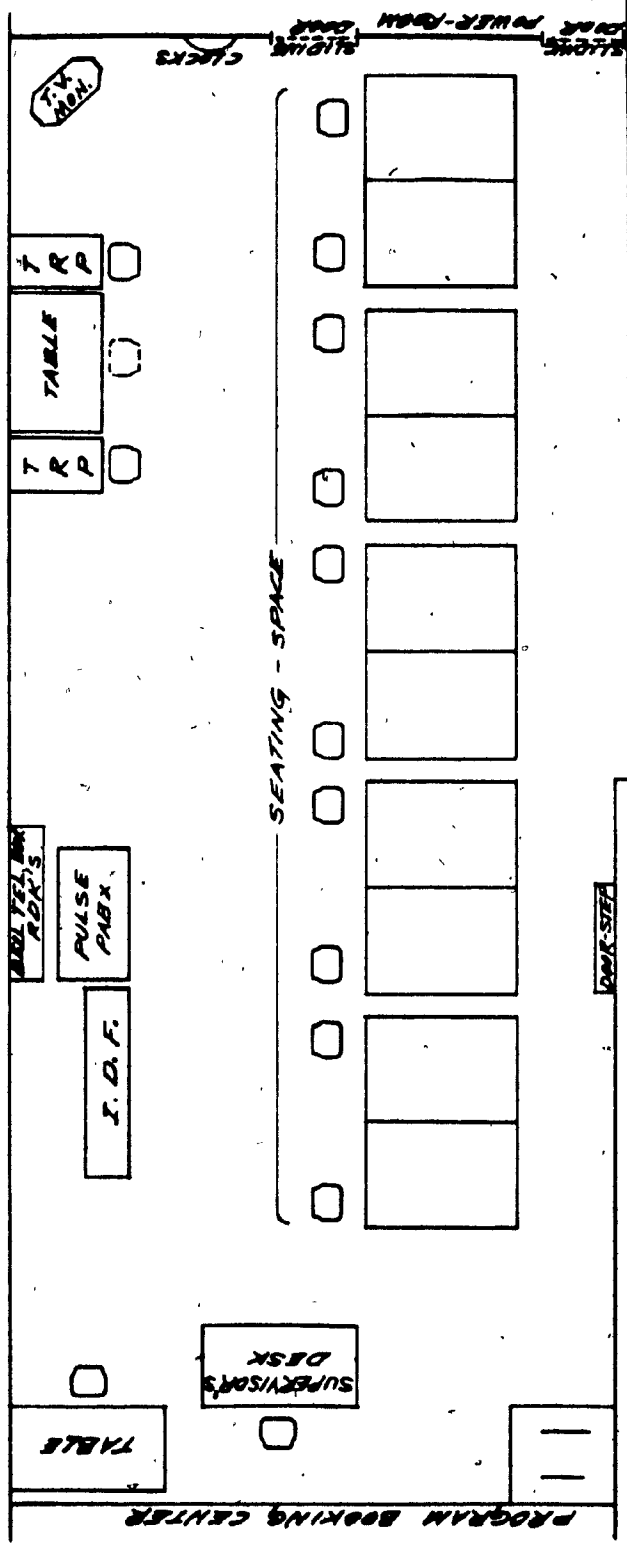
ISPC Floor Layout (sheet 1 of 2)
